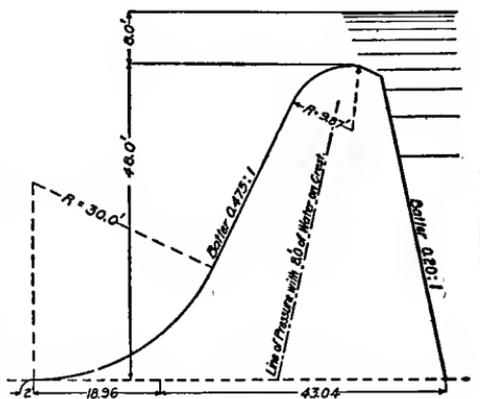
ROLLWAY OF ATLANTA DAM.
